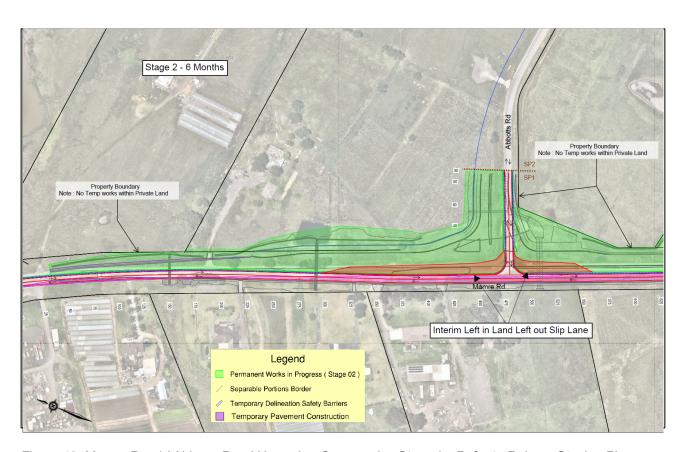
Mamre Road / Abbotts Road Upgrade - Construction Stage 2 - Refer to Robson Staging Plan
